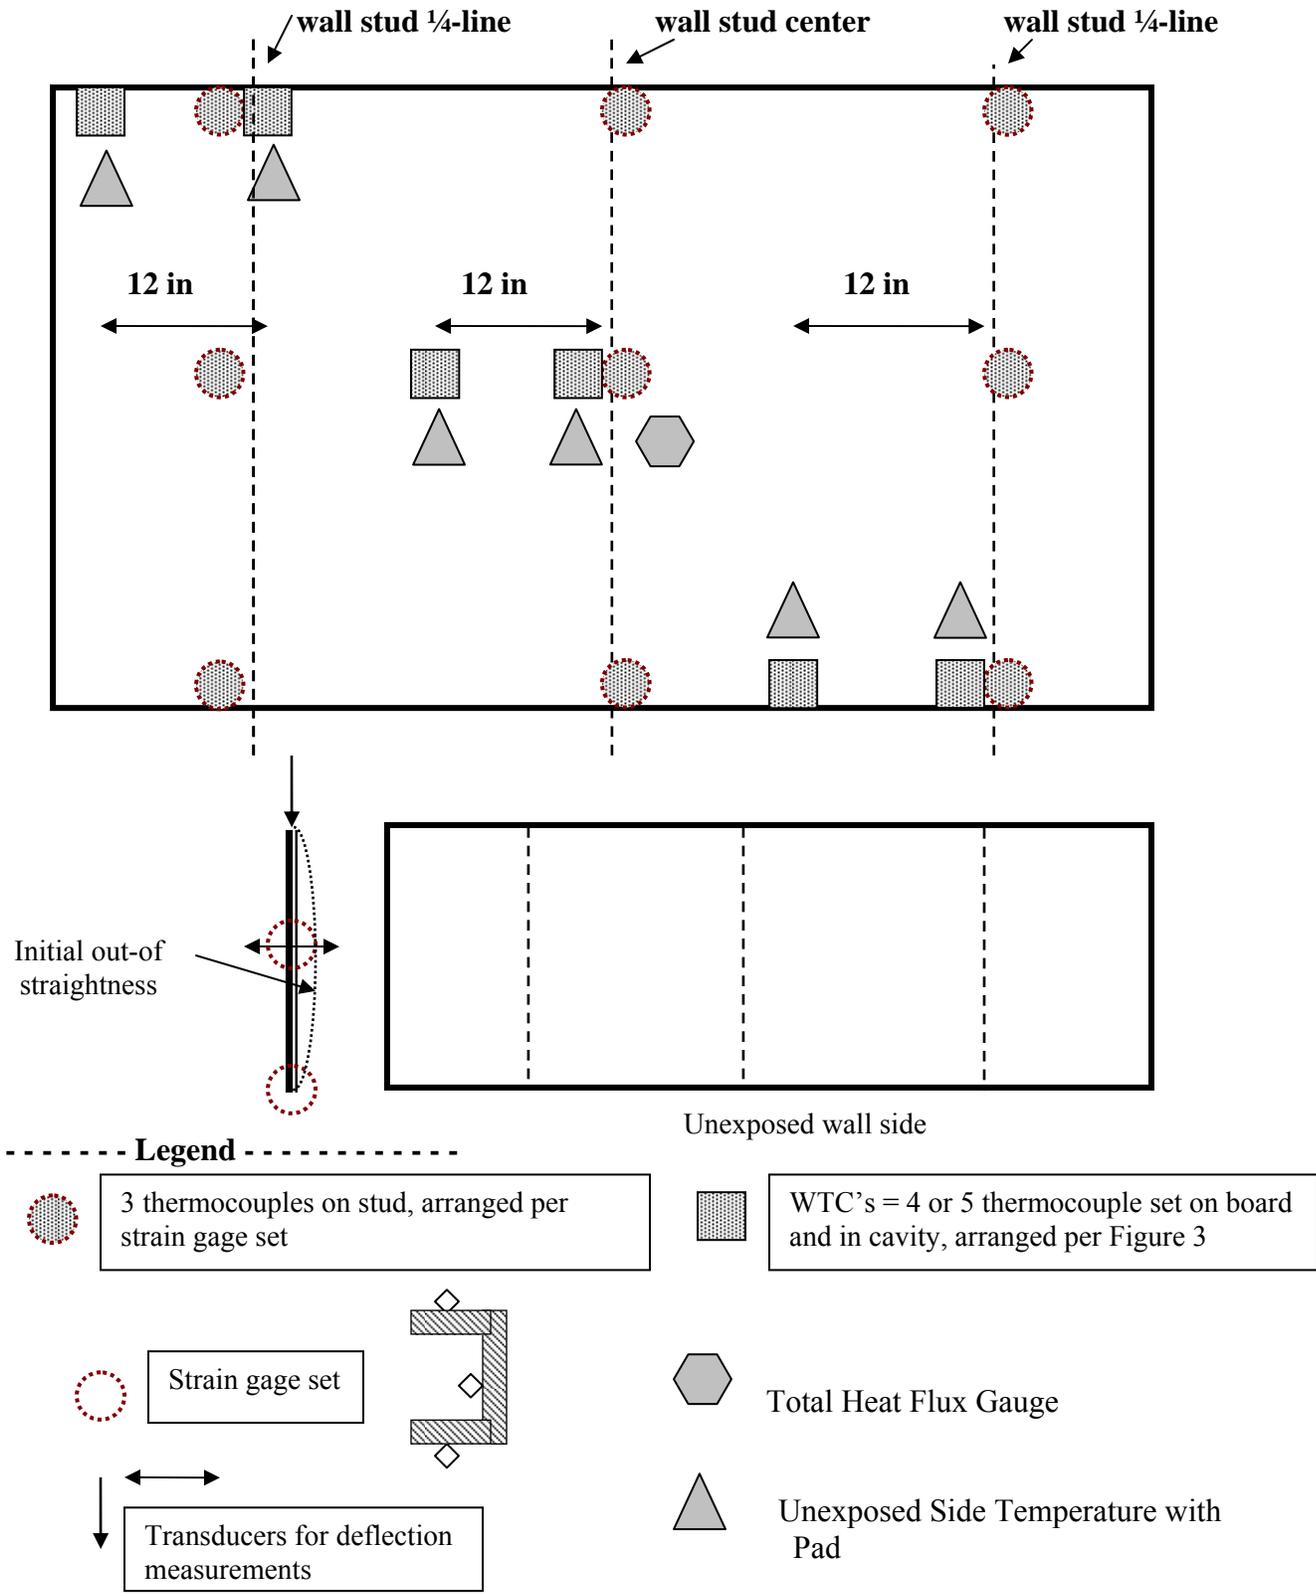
Elevation Layout of Structural and Thermal Instrumentation for Wall Assemblies.
